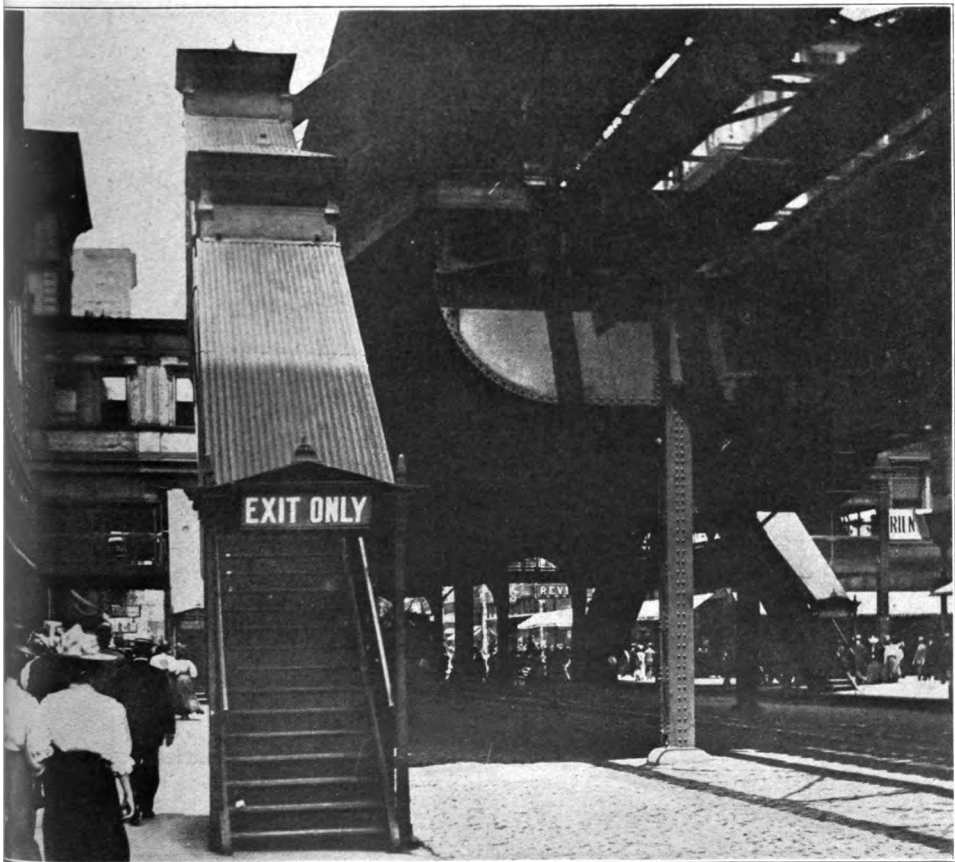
ADAMS AND WABASH STATION LOOKING NORTH. SHOWING OBSTRUCTION TO VIEW ALONG SIDEWALK, AND SHADOW CAST BY STATION AND PLATFORMS. "EXIT ONLY" STAIRS BUT LITTLE USED.
